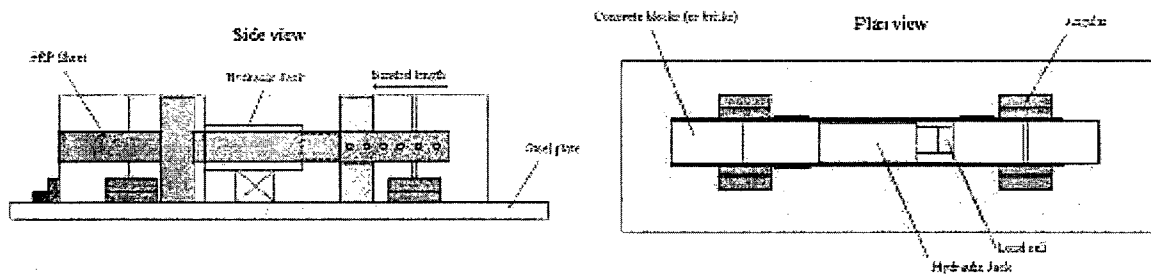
Casareto *et al.* (2003) Setup for testing Brick specimens
